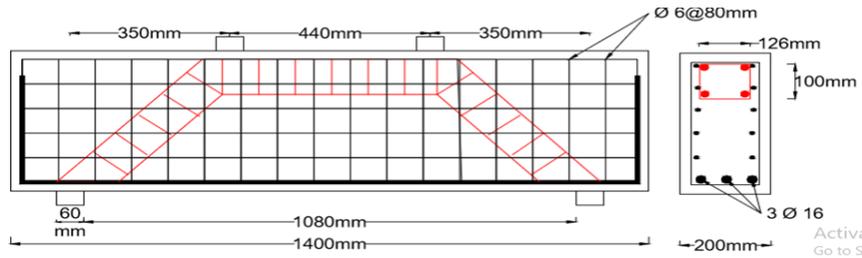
a: Strut reinforcement along the compression-strut of Deep-beams
